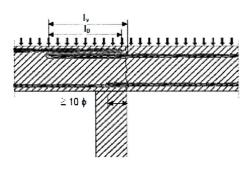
Overlap joint for rebar connections of slabs and beams
